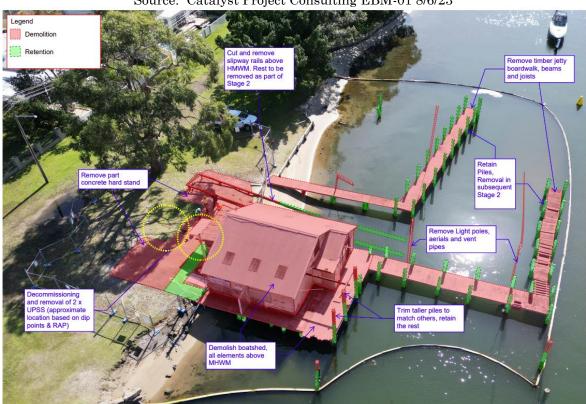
Demolition Plan showing removal of all structural elements above the water line.
